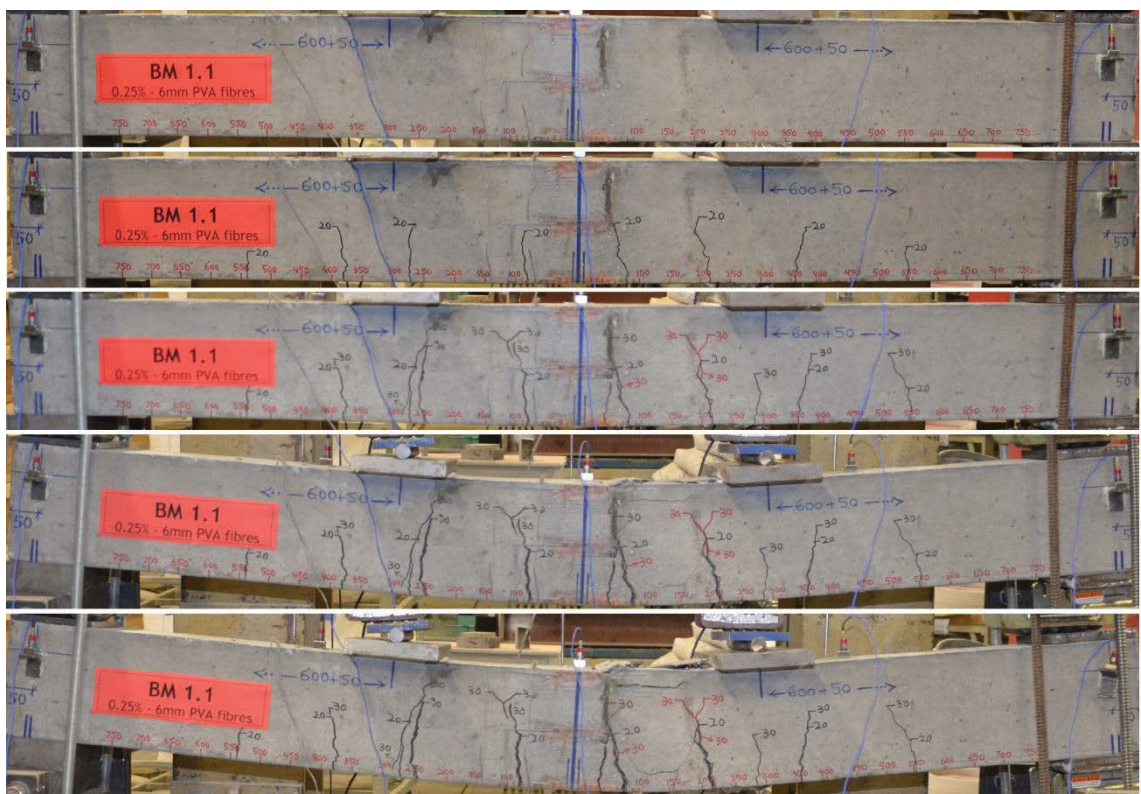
Cracking patterns of beam 6PVA0.25% (A)
